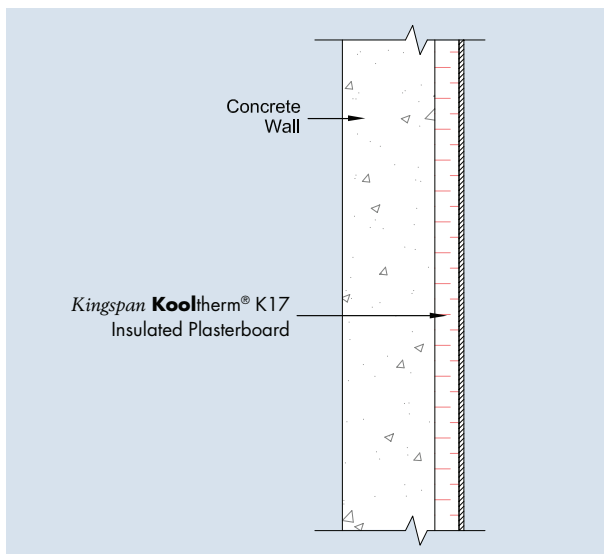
Side elevation - Concrete wall with Kingspan Kooltherm® K17 Insulated Plasterboard
